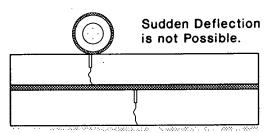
Overlay joint mismatched from existing joint to provide a sleeper-slab arrangement and improved load transfer (25).
